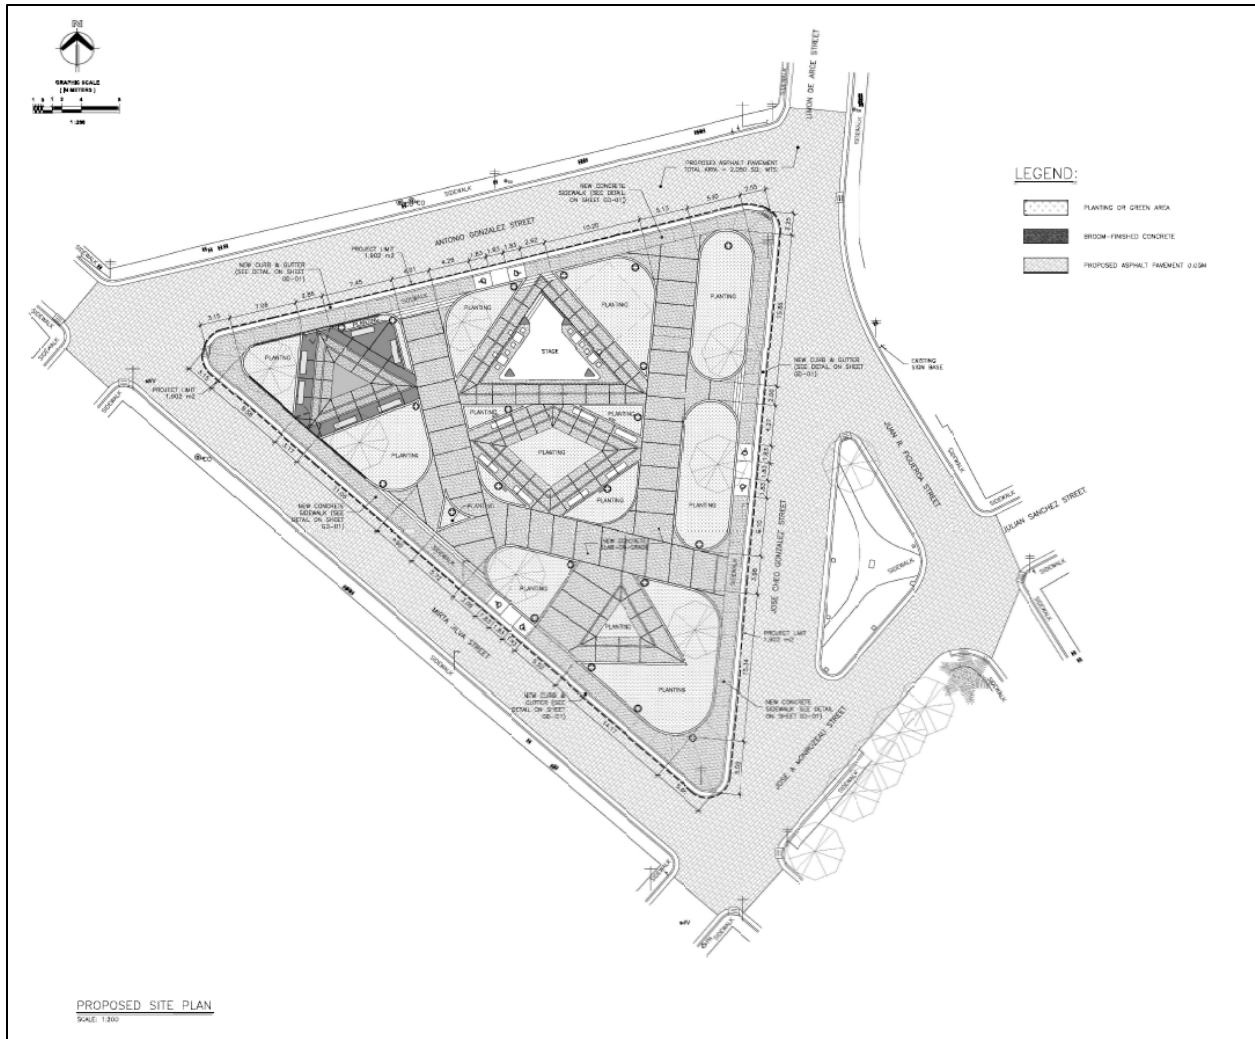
Proposed Site Plan (see Sheet C-03 of Exhibit 13)
